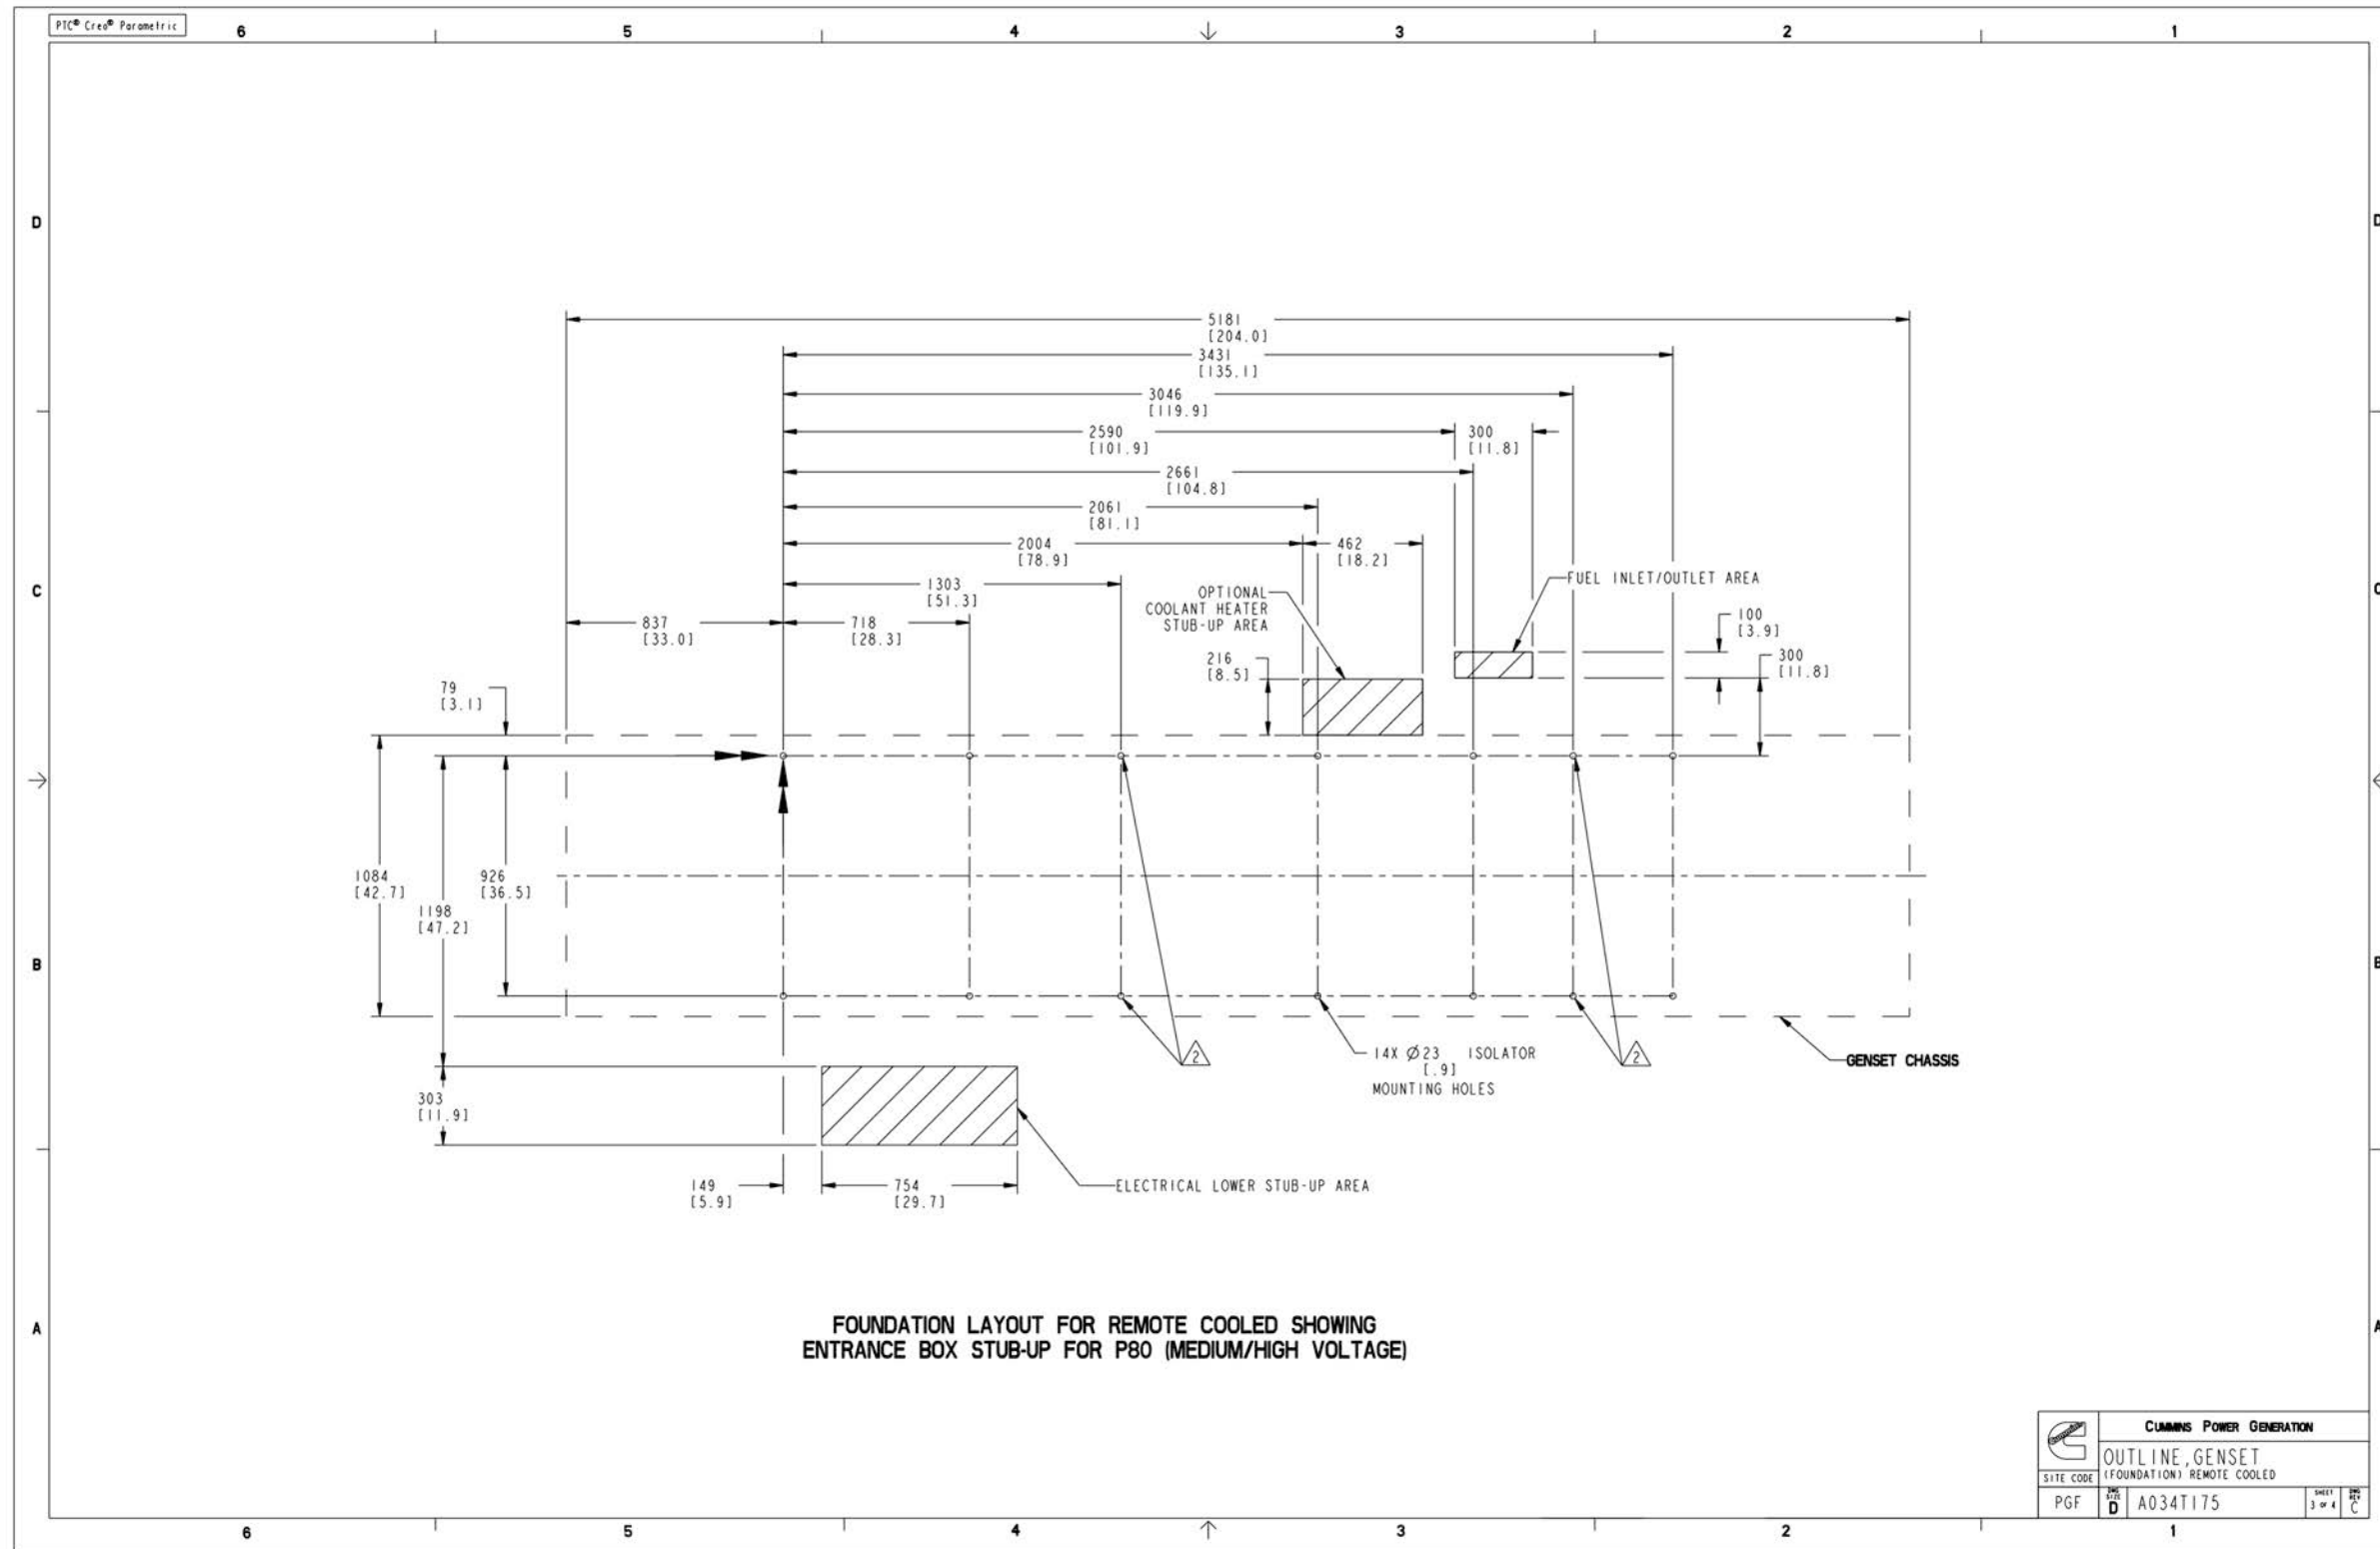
FOUNDATION DRAWING FOR REMOTE COOLED GENERATOR SET (SHEET 3)
